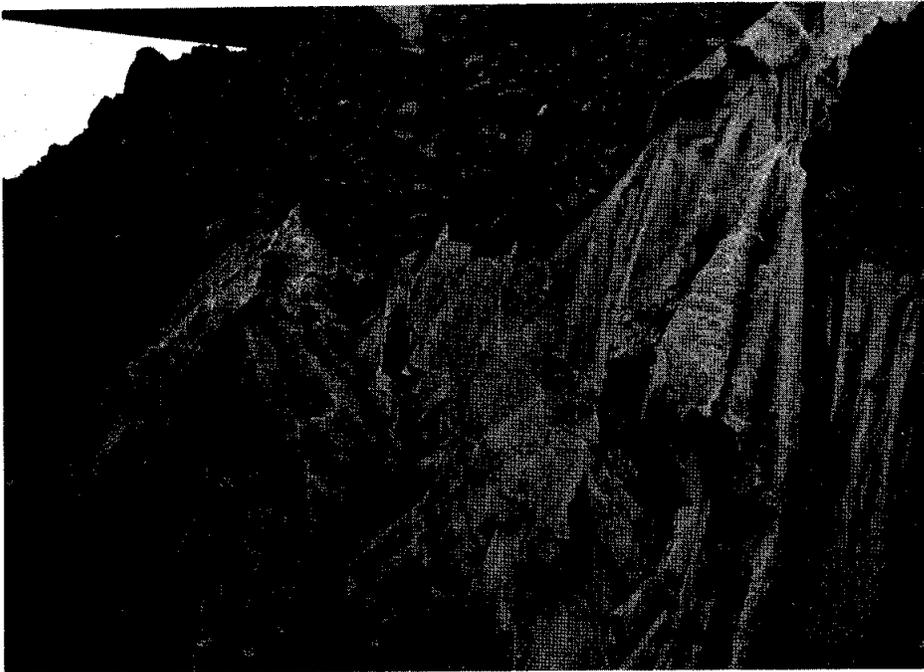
, Geotextile failure due to ultraviolet light exposure, Unalaska Bridge Riprap Liner, Case 3-3.
